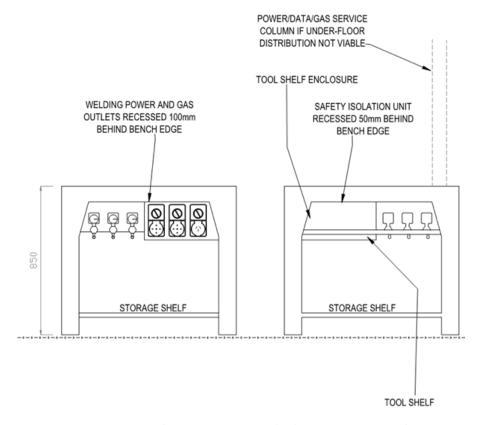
Elevation in direction 'B' as shown on the plan (left). Elevation in direction 'C' as shown on the plan (right).
